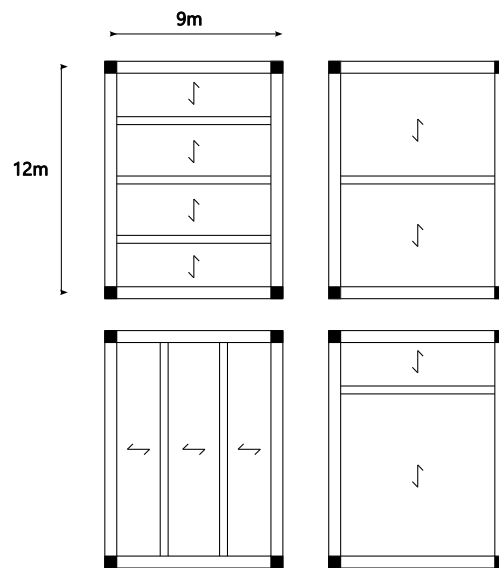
Deck Typologies from left to right: cast in place, mixed concrete and steel, CLT
